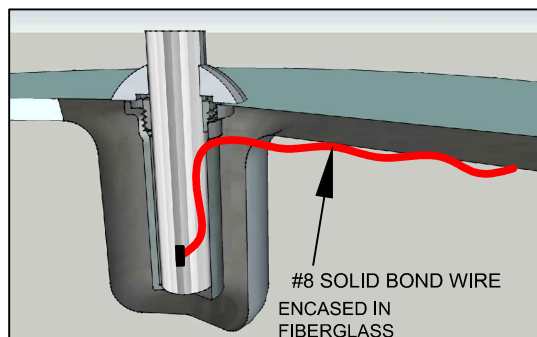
DETAIL REFLECTS ANCHOR INSTALLATION IN NESPA SHELLS ONLY.
